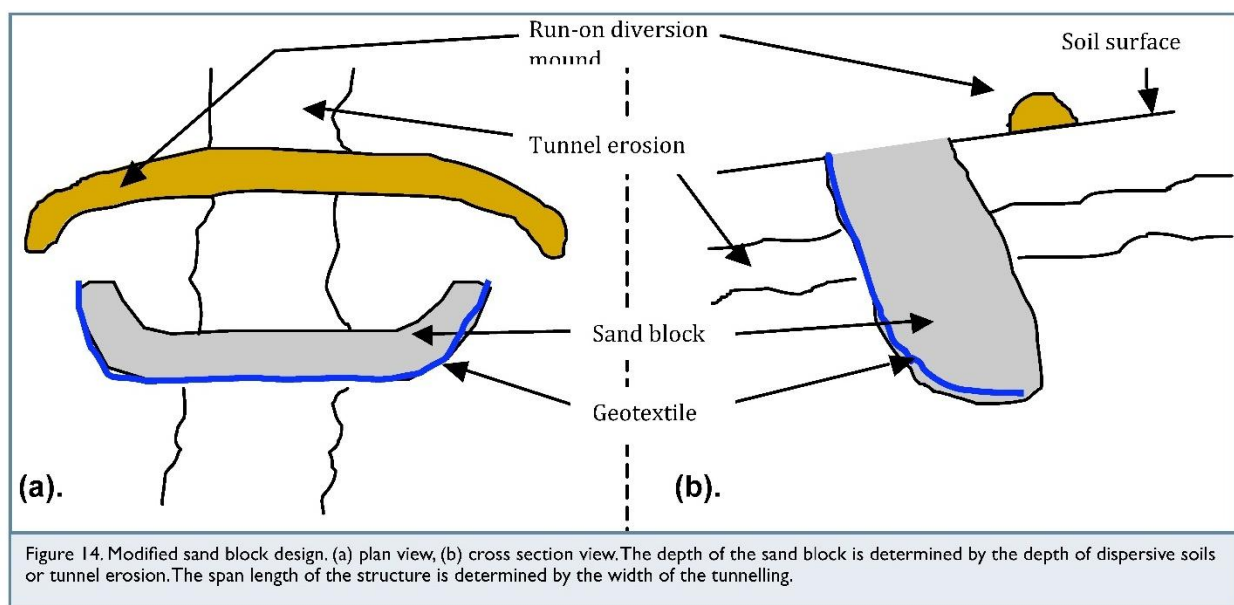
Modified sand block design. (a) plan view, (b) cross section view. The depth of the sand block is determined by the depth of dispersive soils or tunnel erosion. The span length of the structure is determined by the width of the tunnelling.
